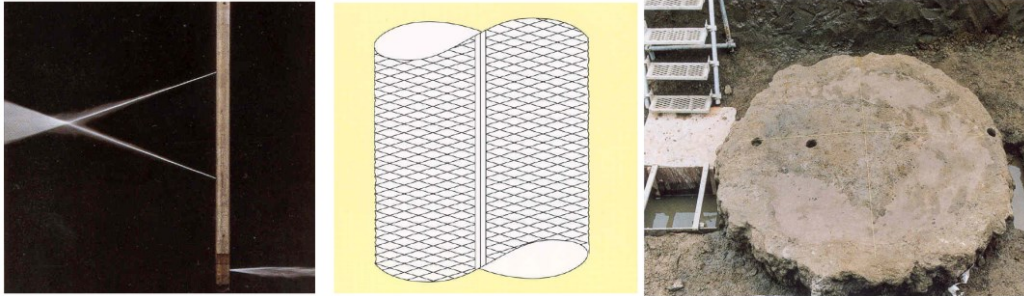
X-Jet grouting and type of soilcrete column forming (X-Jet 2002)
